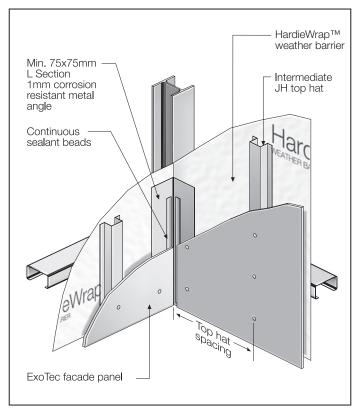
INTERNAL CORNER CUTAWAY DETAIL
